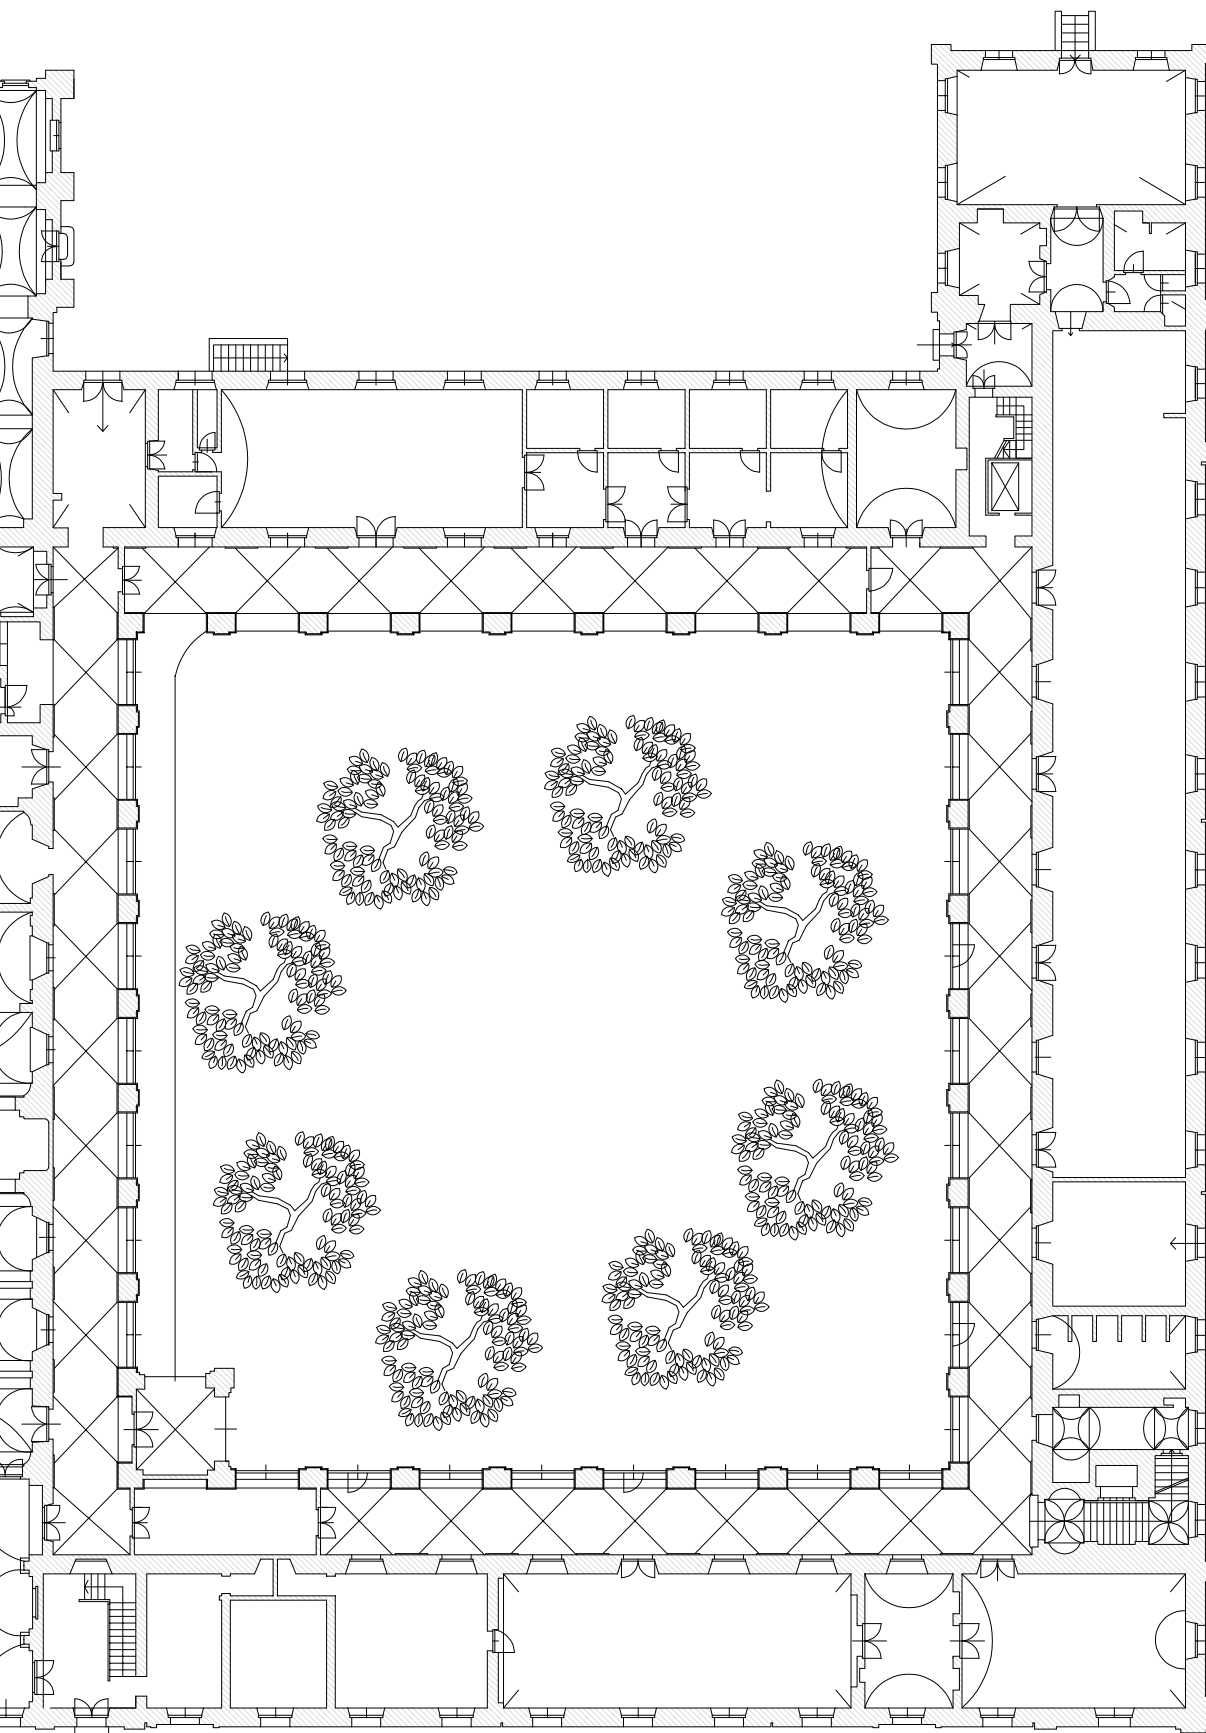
Ground floor plan of the Chiarugi Pavilion as it stands today, drawing provided by architect
